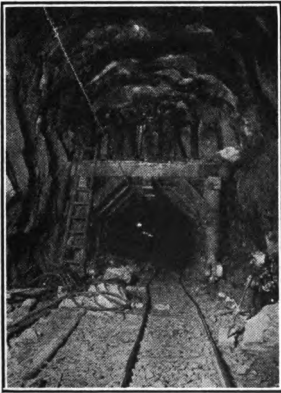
TRAVELING TIMBER PLATFORM FOR ENLARGING OLD TUNNEL.
